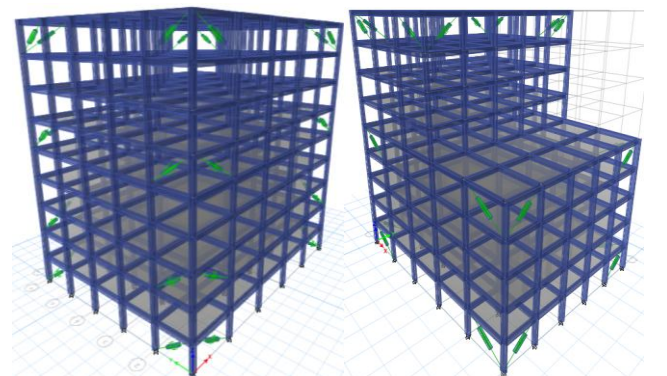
3d plan of model1 and model2 provided with dampers respectively.
